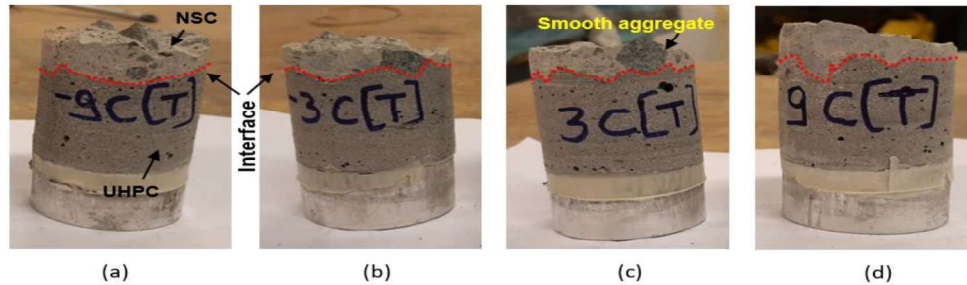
Bond failure and failure mode at – (a) extreme bottom; (b) center-bottom; (c) top-center; (d) extreme top
